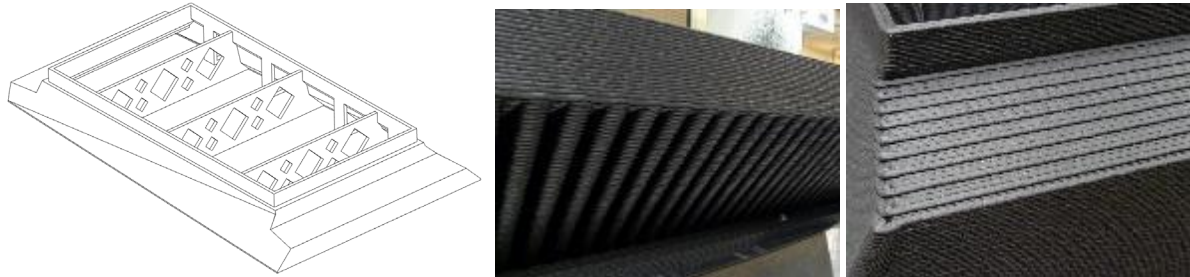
Left: mold design for north side of the residential building. Middle: supporting structure printed underneath the horizontal mold surfaces. Right: initial printing pattern that was used at the horizontal surfaces.
